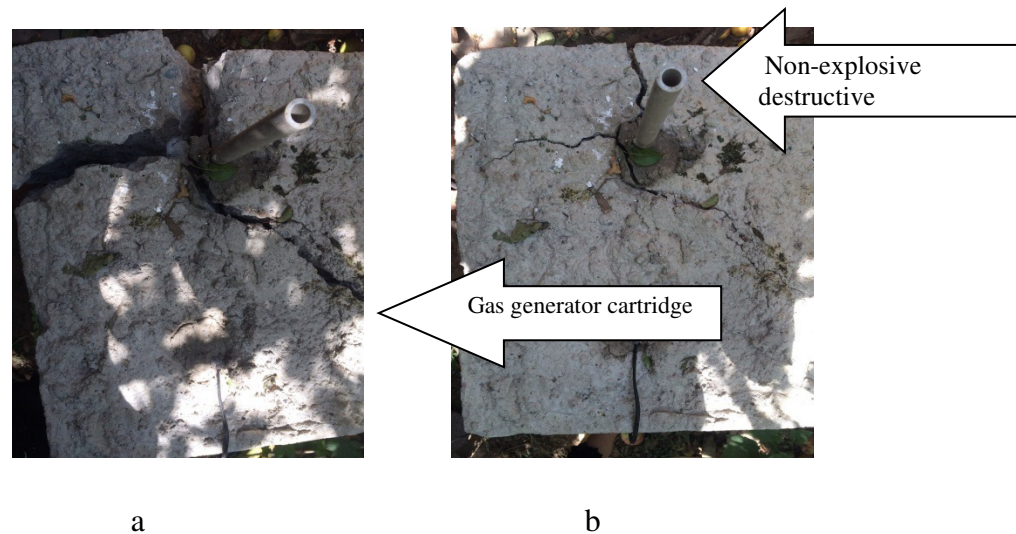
Destruction of a reinforced concrete column of a non-explosive destructive mixture
